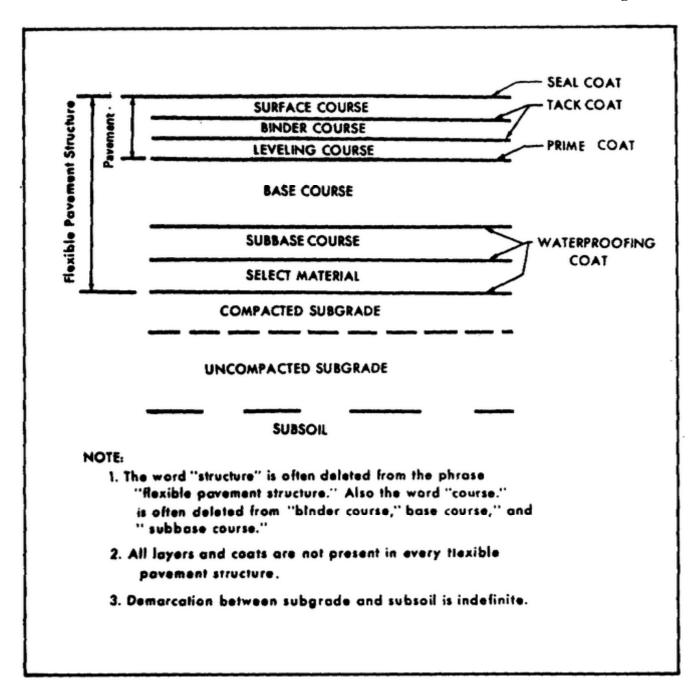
TYPICAL FLEXIBLE PAVEMENT.
